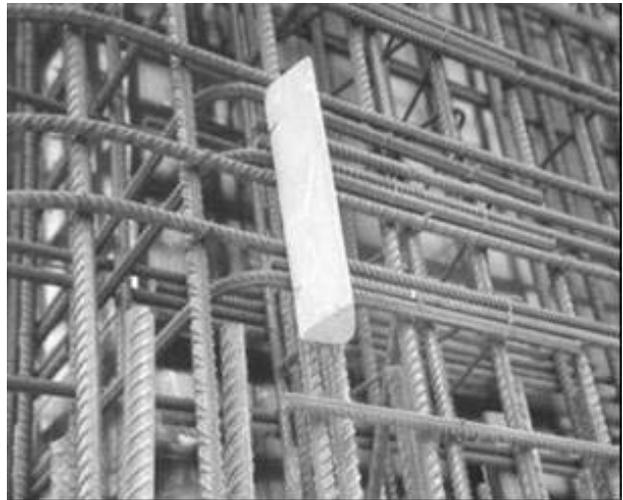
Solid and reliable type of concrete spacer with reliable fixing, and with strength to resist even very high concrete pressures, and still with no or only marginal imprint on the finished concrete surface.
